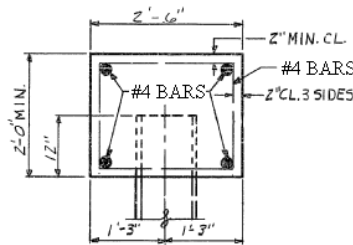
Pier Cap Cross Section A-A (Ref. GDOT Drawings)
